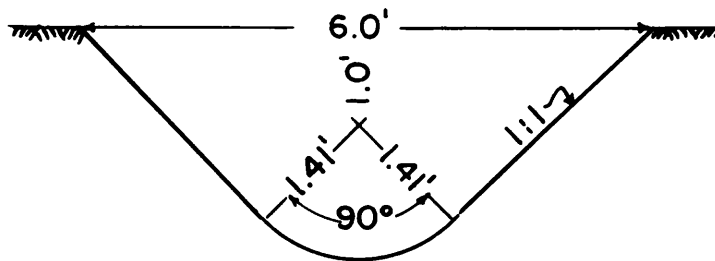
Section of hand placed concrete lined canal with reinforcing, Hidalgo County Water Control & Improvement District number six
